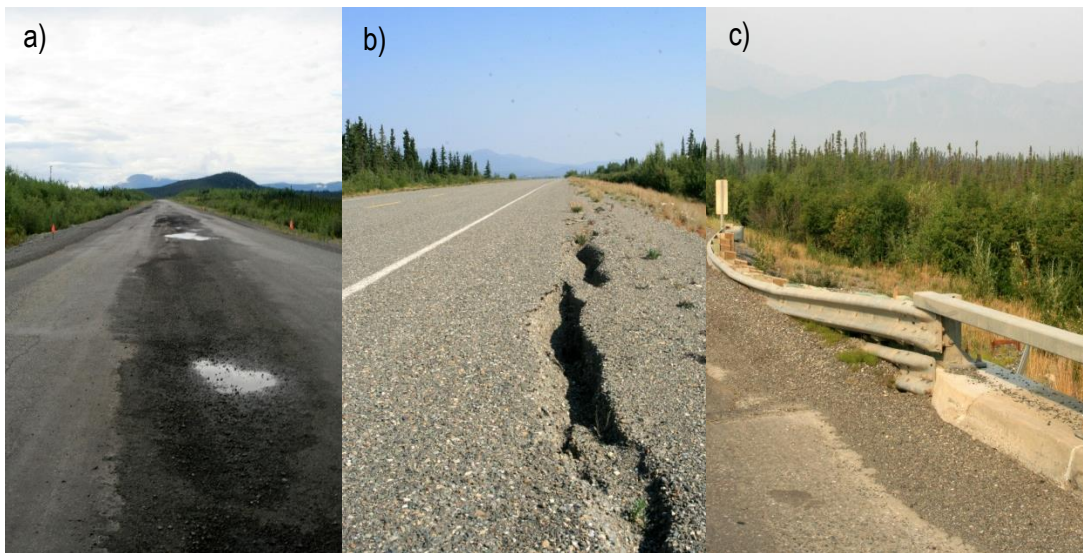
5: Engineering problems: a) sinkhole; b) longitudinal cracking; c) guardrail sinking.
